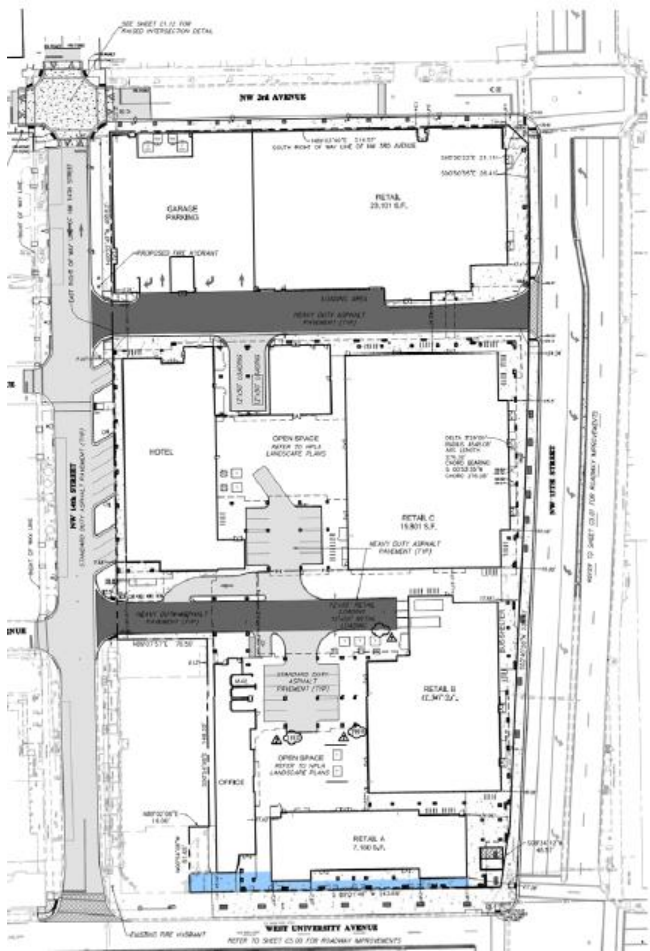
" – UNIVERSITY AVENUE (ON-SITE)
